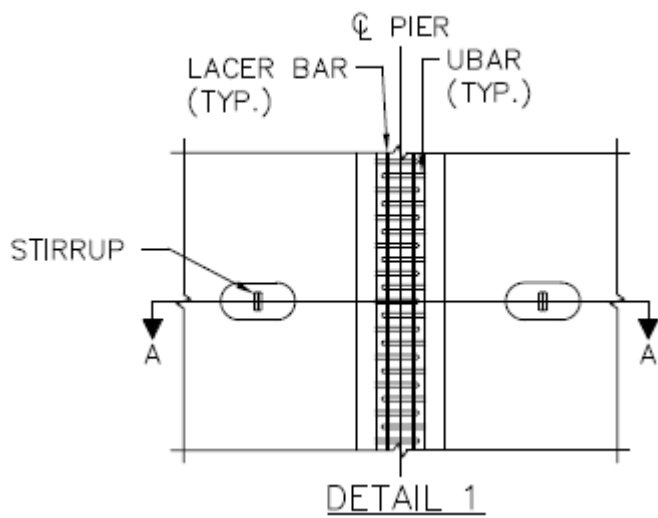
Detail panel-to-panel connection over piers (see Fig. 5).
